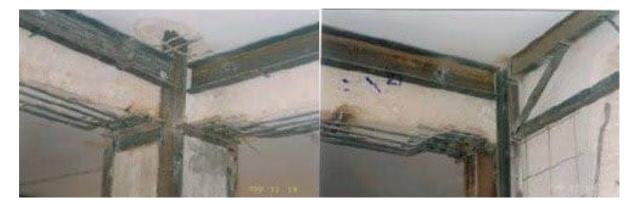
Strengthening a beam, slab & column (left) and Strengthening of beam and slab (right) (credit: researchgate)
